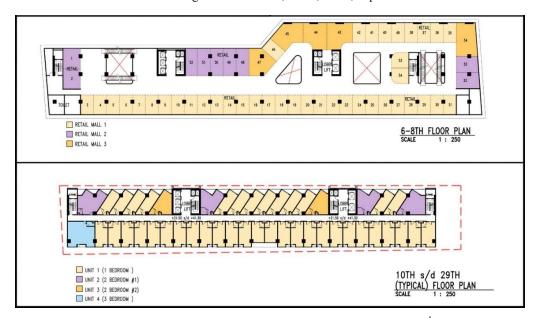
Building design of apartment with shopping center in the 2<sup>nd</sup> scenario (contd.)
